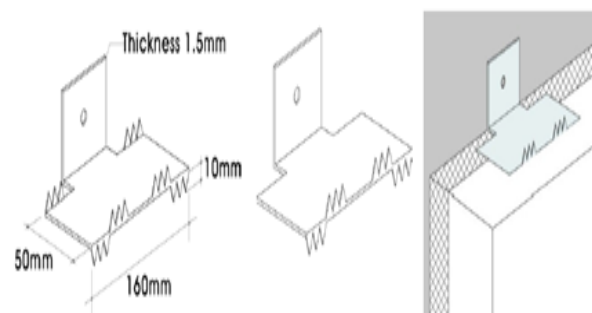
Steel fasteners for mechanically fixed external insulation systems with VIPs.
